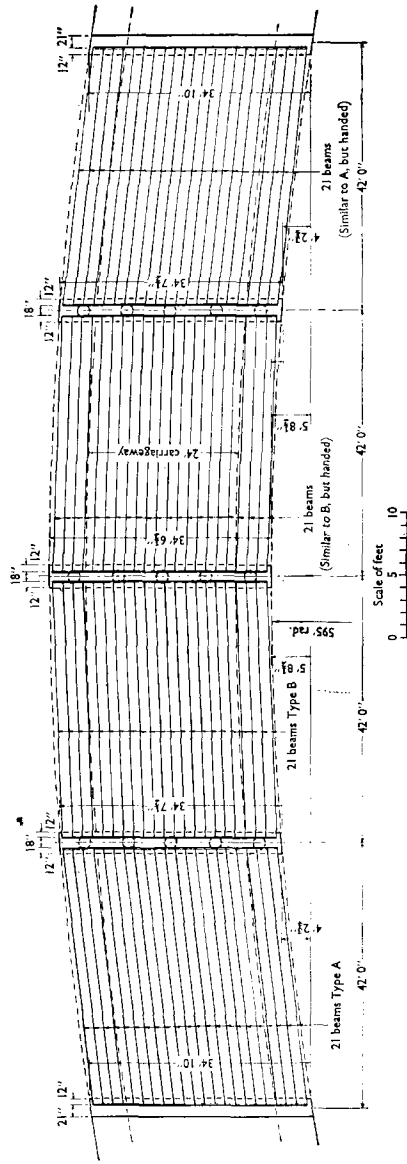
PLAN OF WEST BRIDGE AT TRANSOM LEVEL
